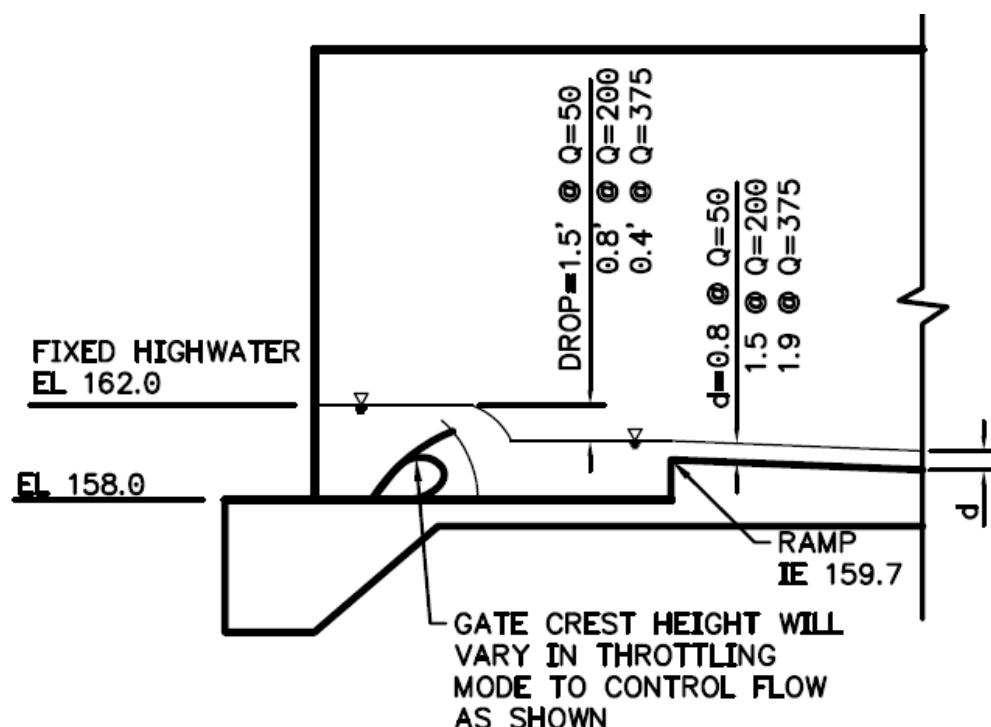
Diagram of an Obermeyer style ramp gate in head works structure.
